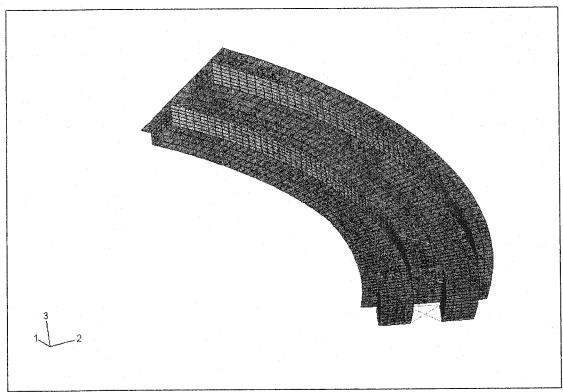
ABAQUS model view of bridge model M1 with concrete deck
